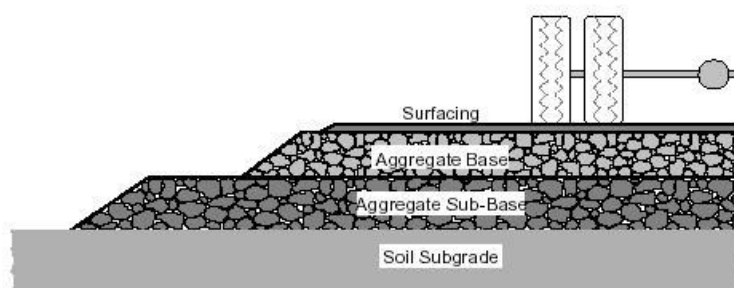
Typical cross-section of a flexible pavement system (COURAGE, 1999)
